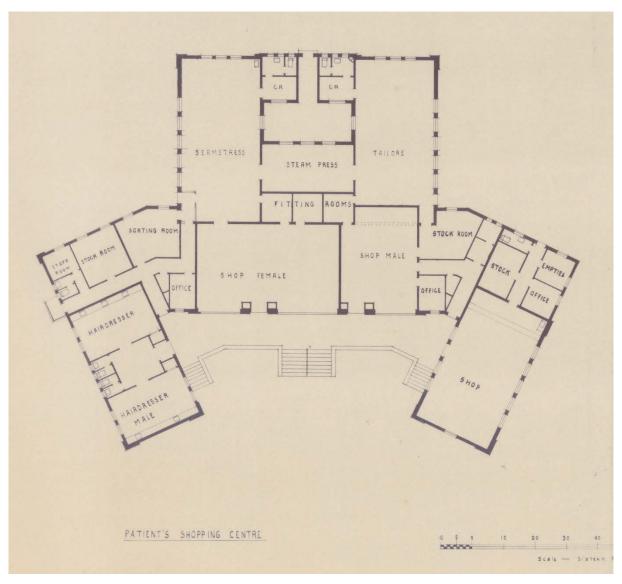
Buildings 44, Patients' Shopping Centre historic ground plans
